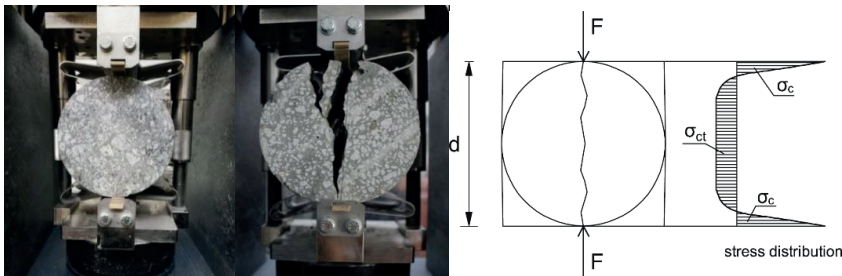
The Brazilian splitting test: specimen in the test stand before and after the failure (left); stress distribution in cross section σ_{ct} – tensile stress, σ_c – compressive stress (right)
